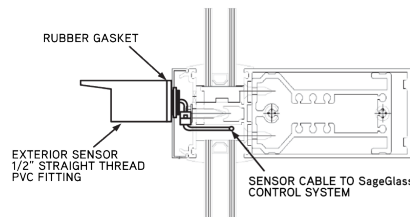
Typical Horizontal Exterior Sensor Wall Mounting Detail (Side View)
